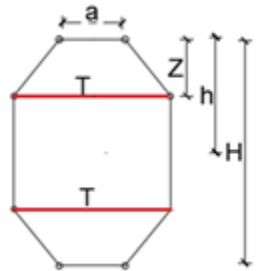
9 Dimensions of the bottle-shaped strut BC
